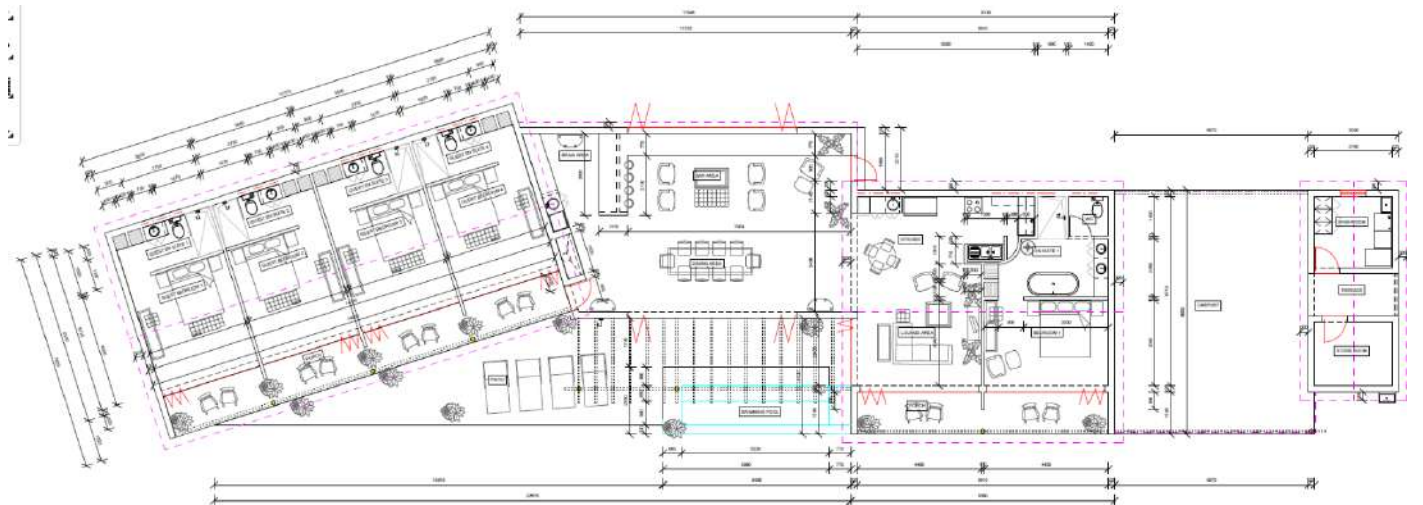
Plans showing renovations- Dwelling 1 (adapted from Vatelier Plancad – Appendix J)
